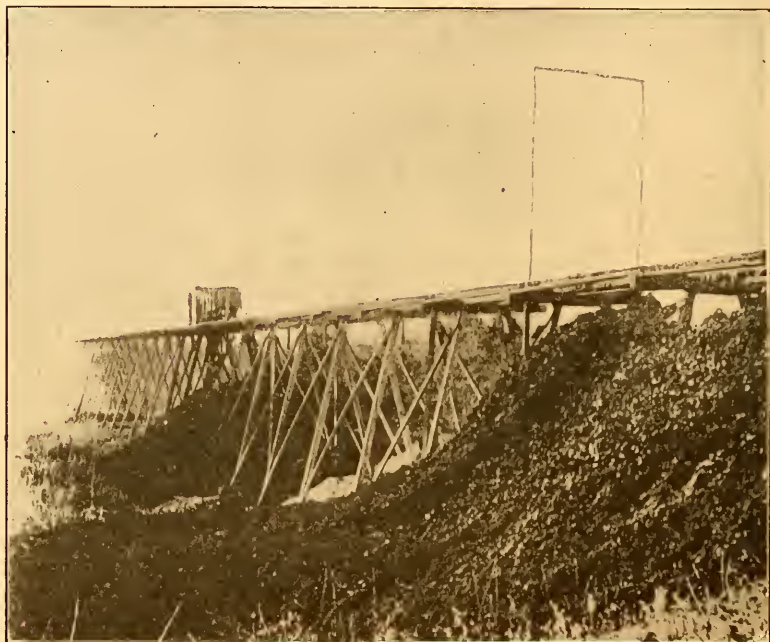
Dumping Pressed Sludge, Worcester Sewage Works.
